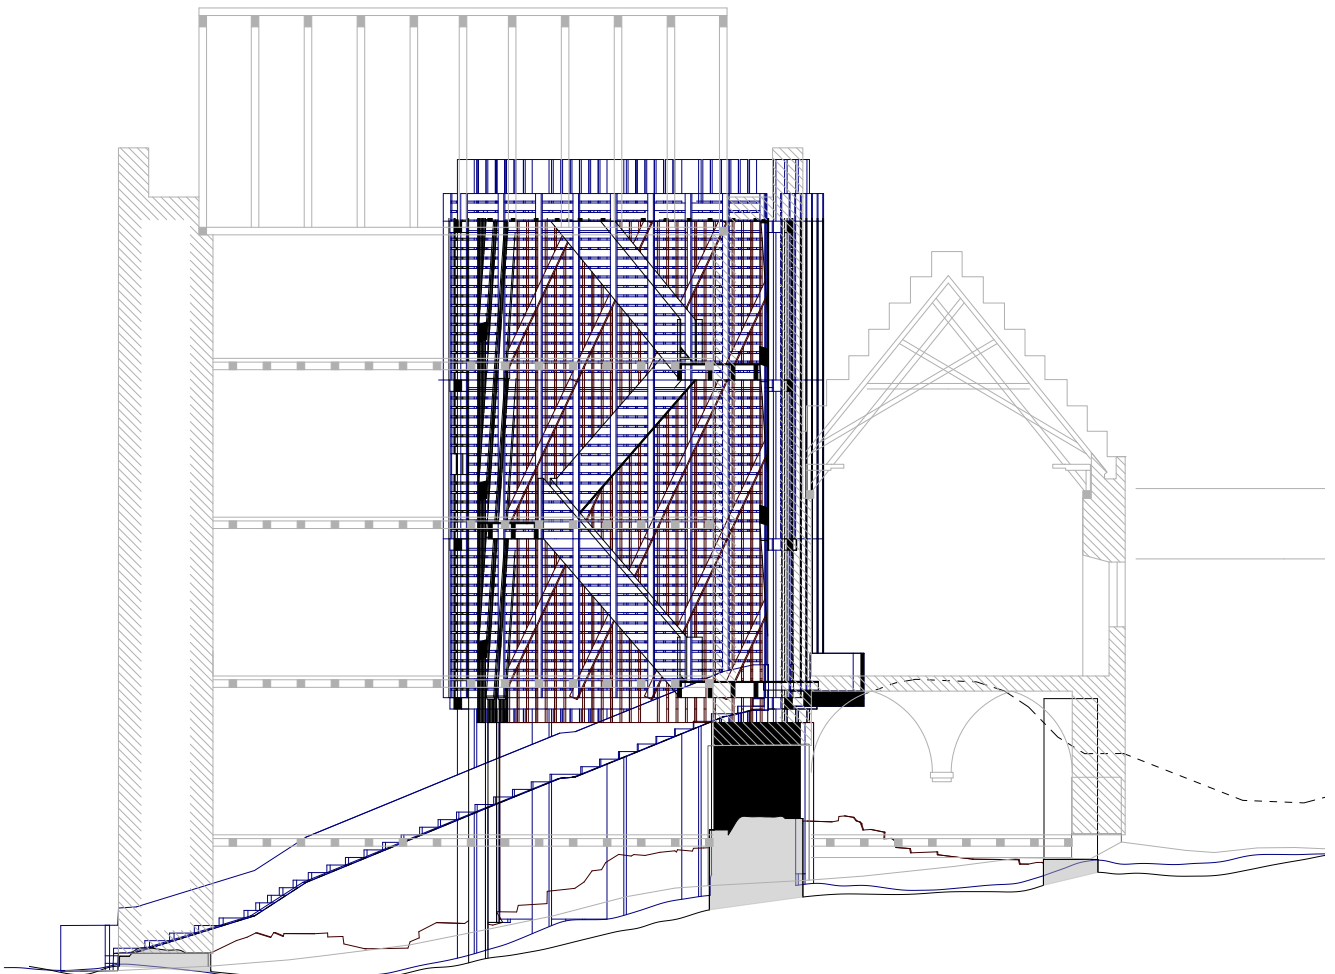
Lookout tower superimposed section 1:200 (A4)
